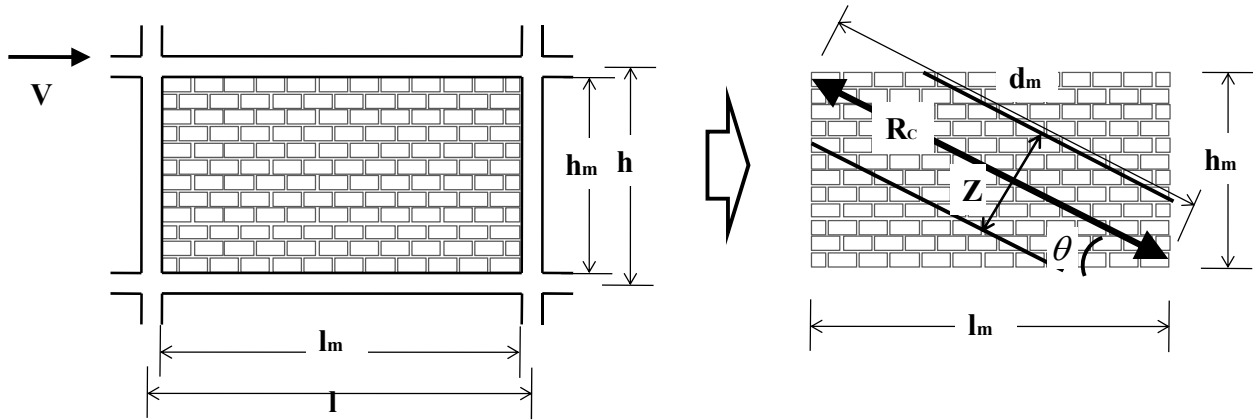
Masonry infill walls and the equivalent diagonal strut (Kwon and Kim, 2010)
